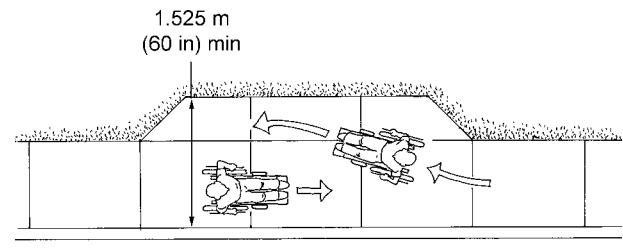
Additional right-of-ways provide passing spaces on narrow sidewalks.
